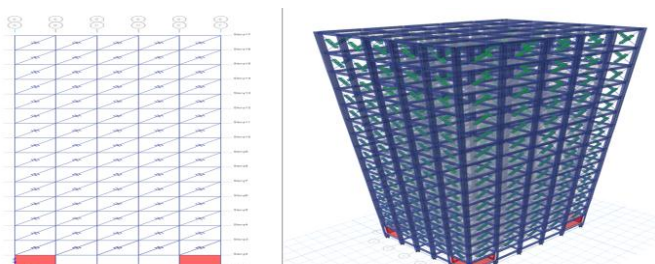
(G+15) storied building with infill wall and shear wall with brick infill in open ground storey.
